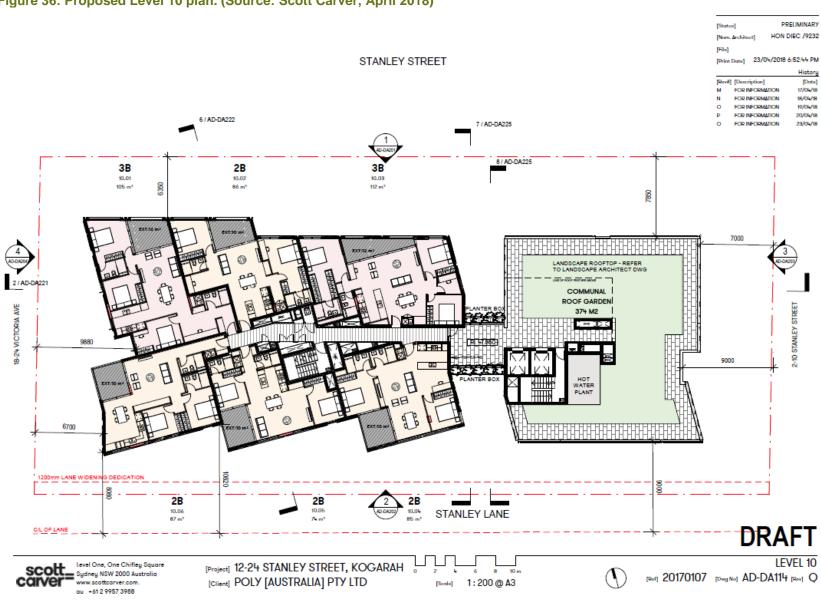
Proposed Level 10 plan. (Source: Scott Carver, April 2018)
